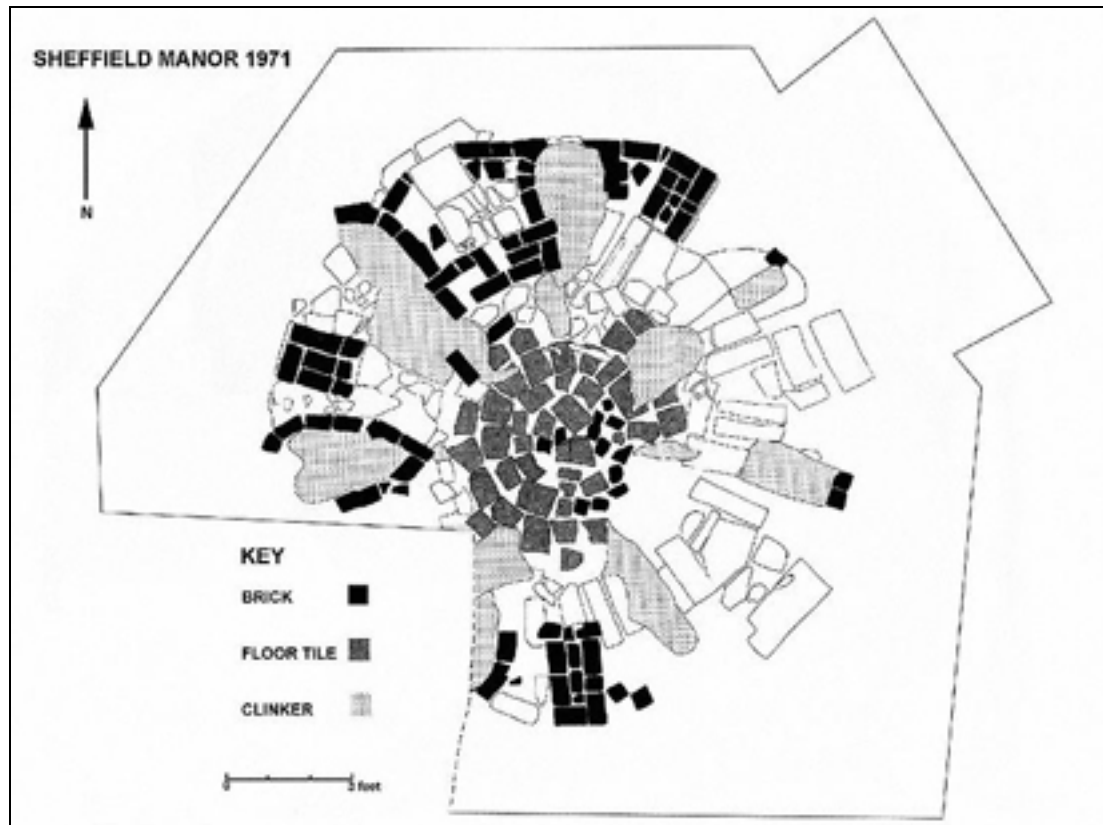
Plan of the Kiln floor, showing its position within the hexagonal room.
